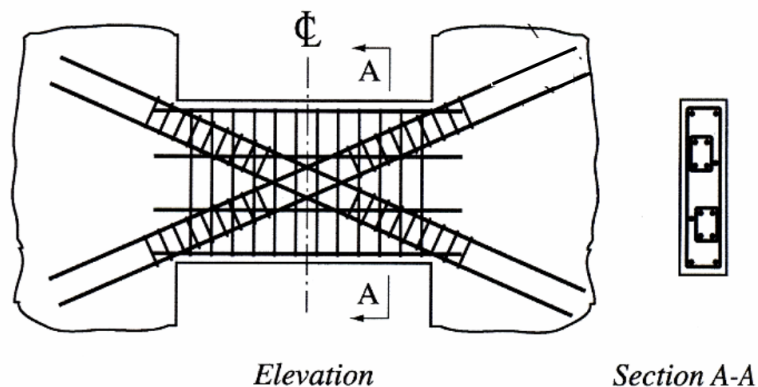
Schematic of reinforcement in coupling beams [from ACI318M, 2002]
